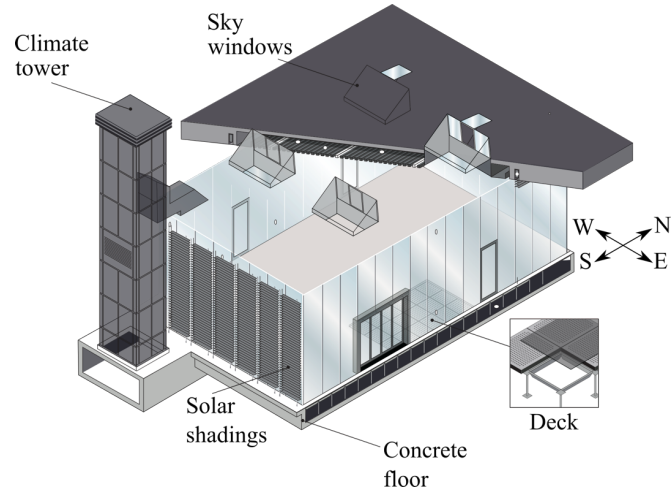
Building configuration with glazed facades, dynamic solar shades, deck and concrete floor, sky windows, and climate tower.
